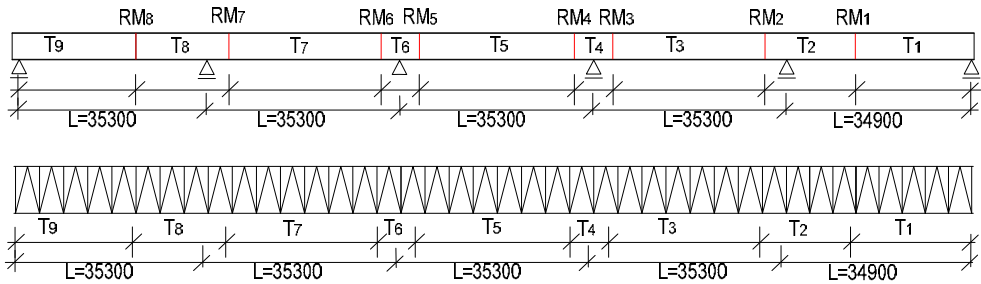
Mounting joints of a continuous web girder bridge on 5 spans
